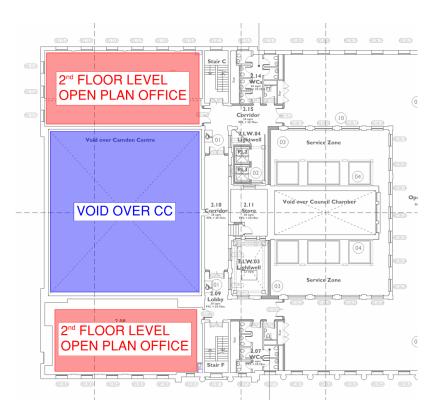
Horizontal adjacencies to Camden Centre on Second Floor level in proposed development
